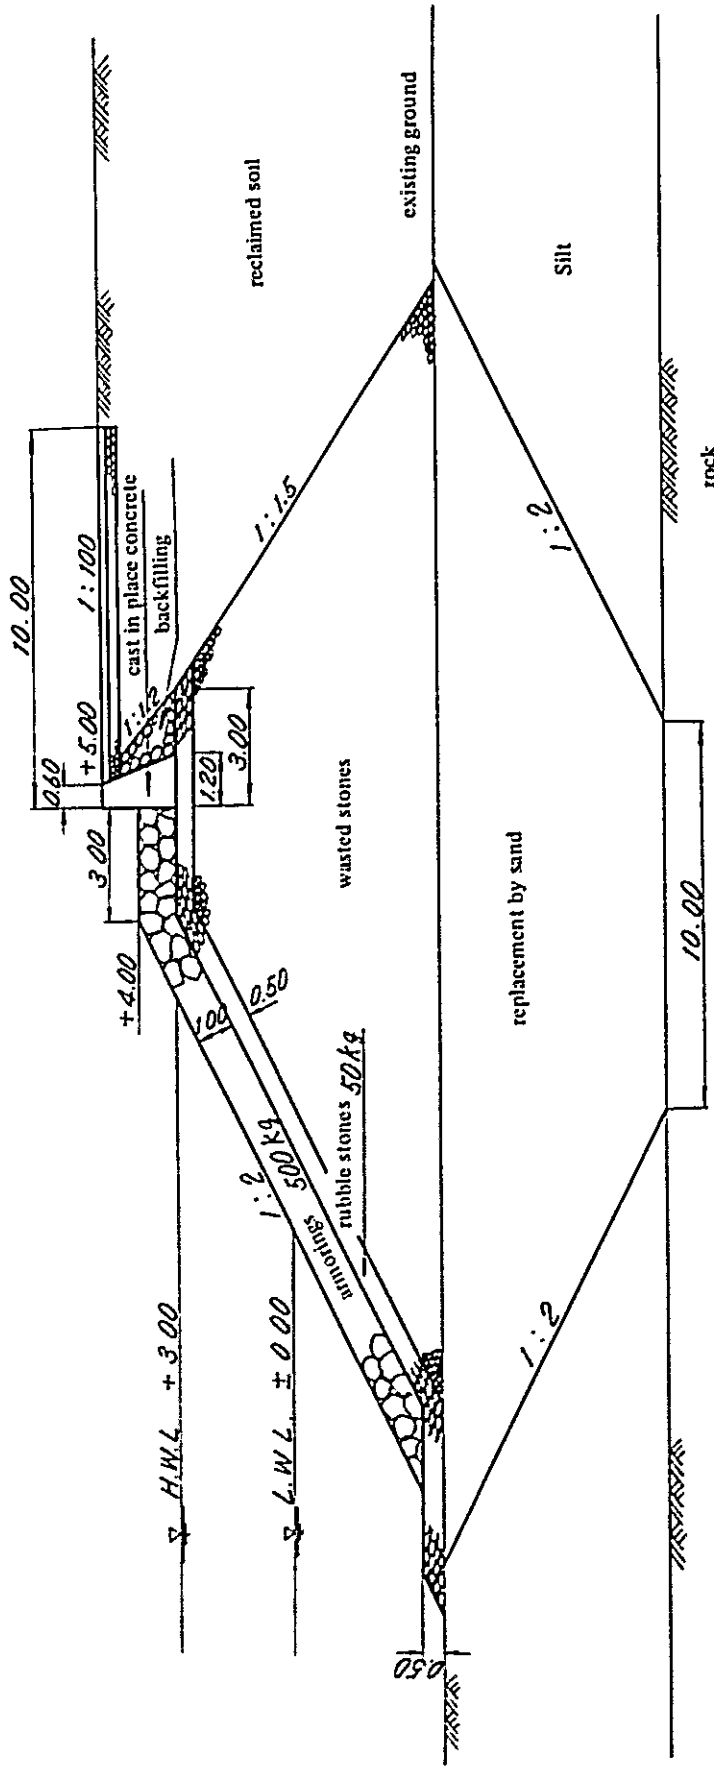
Standard Cross Section of Revetment (South Caldera)
